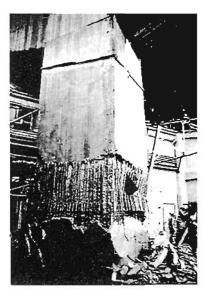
Hanshin Expressway, Kobe: Flexure/shear failure at laps in main bars - bond lost with cover concrete
